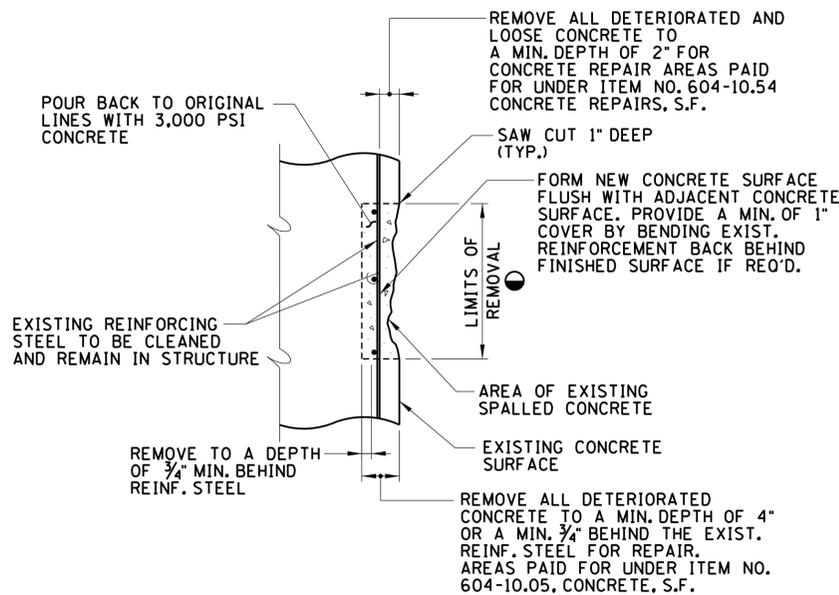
DETAIL SHOWING AREAS OF EXISTING SPALLED CONCRETE SURFACES TO BE REMOVED AND REPAIRED
